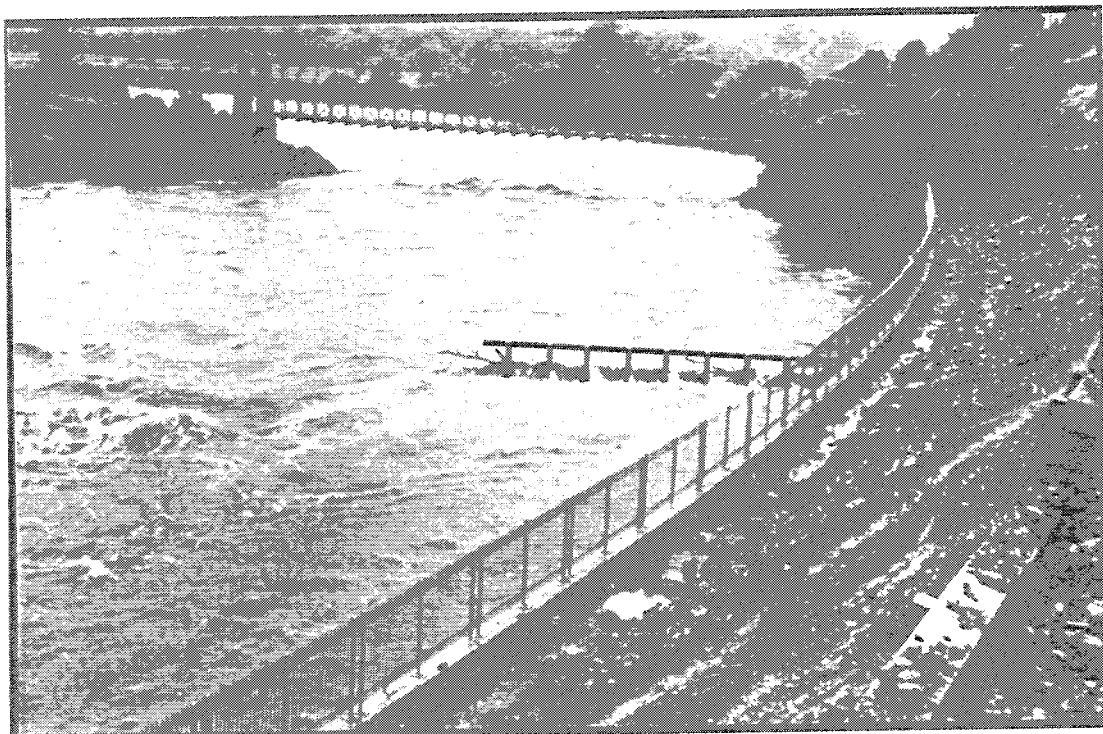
Bypass at Maoribank, 1987. Source: WRC photo
